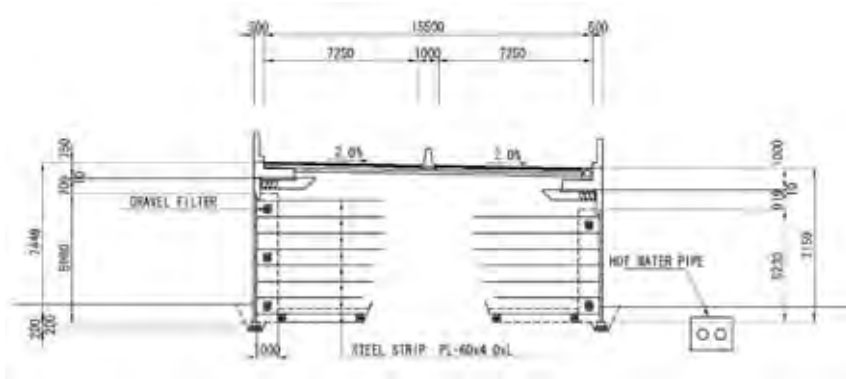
Cross Section of Reinforced Earth Wall of Approach Road (Ikh Toyruu Street)
